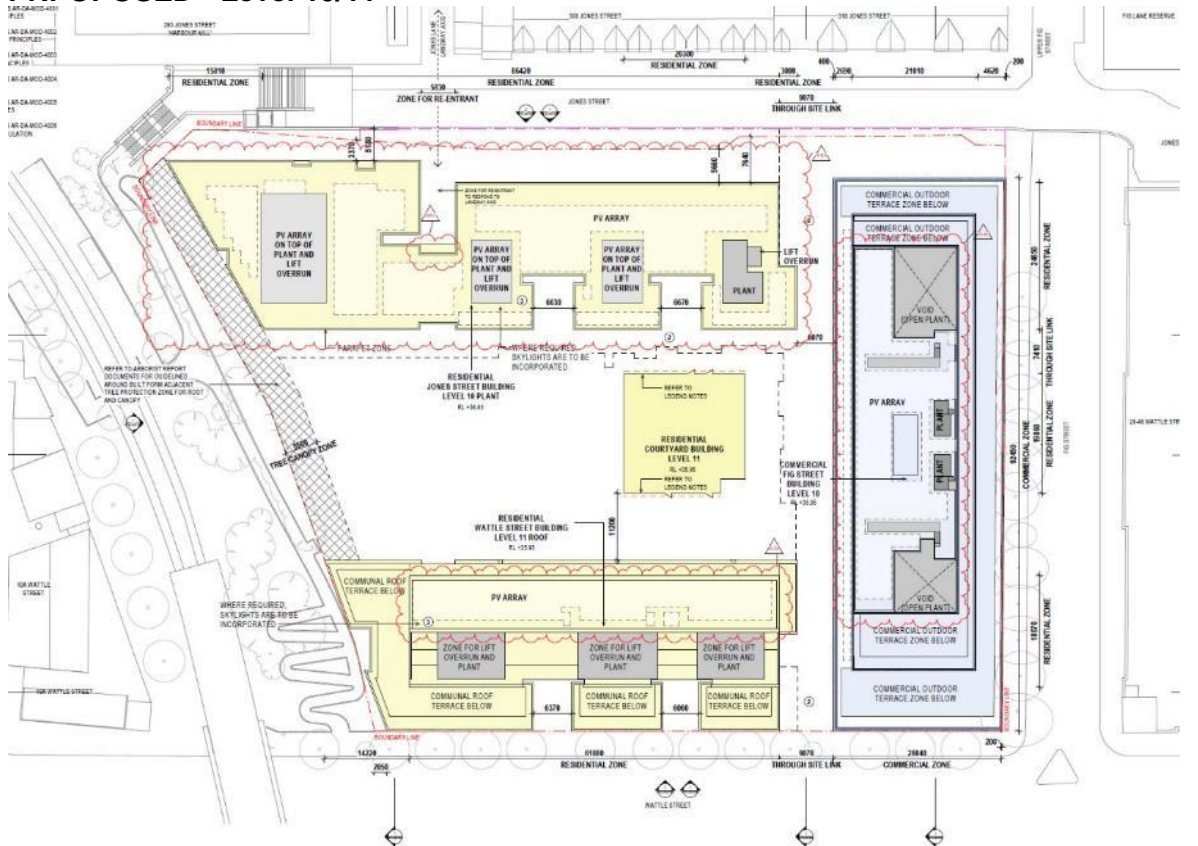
Envelope plans: Approved Roof and proposed Level 10/11
